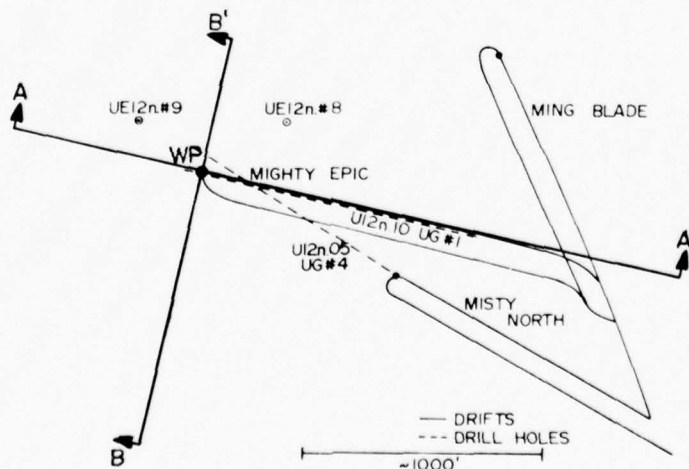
Plan View of Mighty Epic Site Showing Location of Cross-Sections
